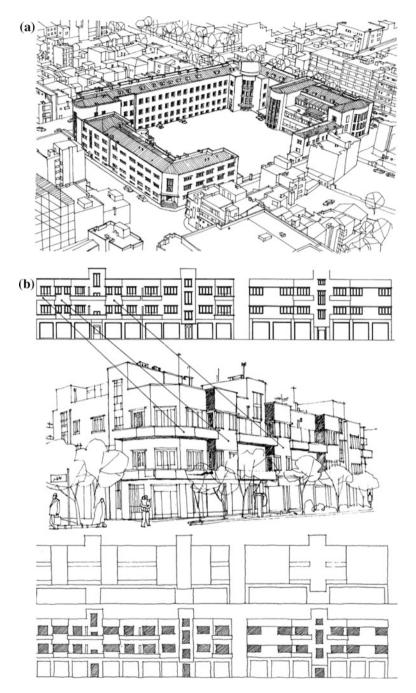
Tehran Kargar Street. a Block 2, one building as an urban block. b A part of block 4, an example of mixed use buildings. Although structurally resistant and can be considered as building stock, if integrated with one new story, but unfortunately, these buildings are gradually demolished and replaced by tall buildings of poor quality
